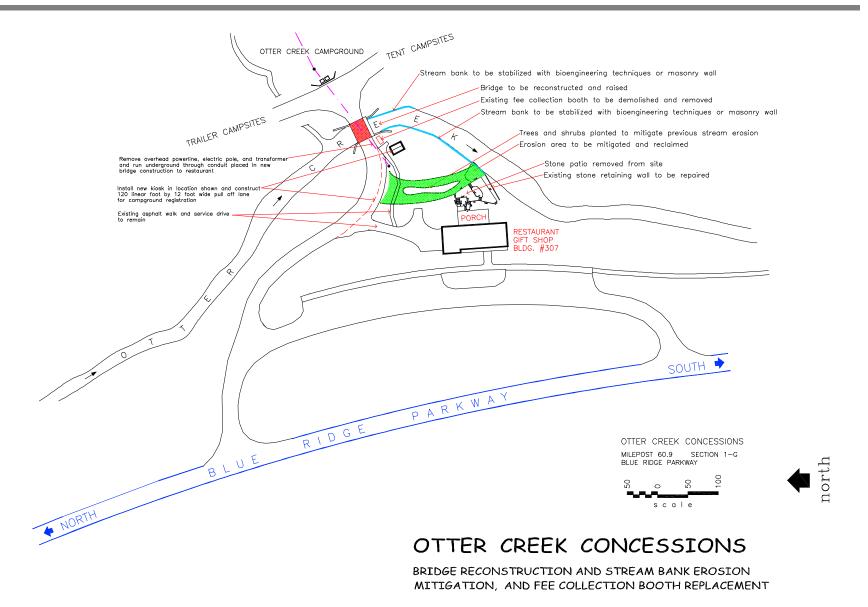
Site Plan for the Otter Creek Bridge and Campground Services Replacement Project
